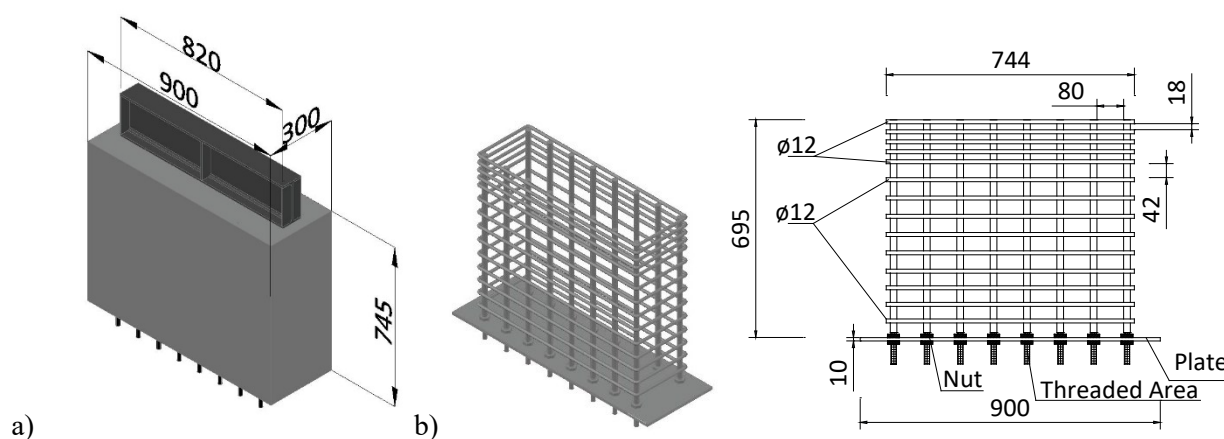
a) Dimensions of specimens, b) steel cage (in mm).
